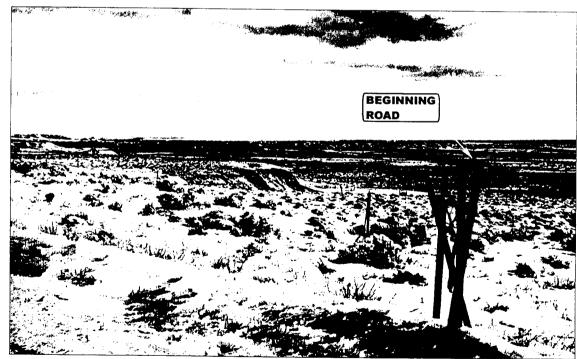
PHOTO: VIEW FROM BEGINNING OF PROPOSED ROAD RE ROUTE
